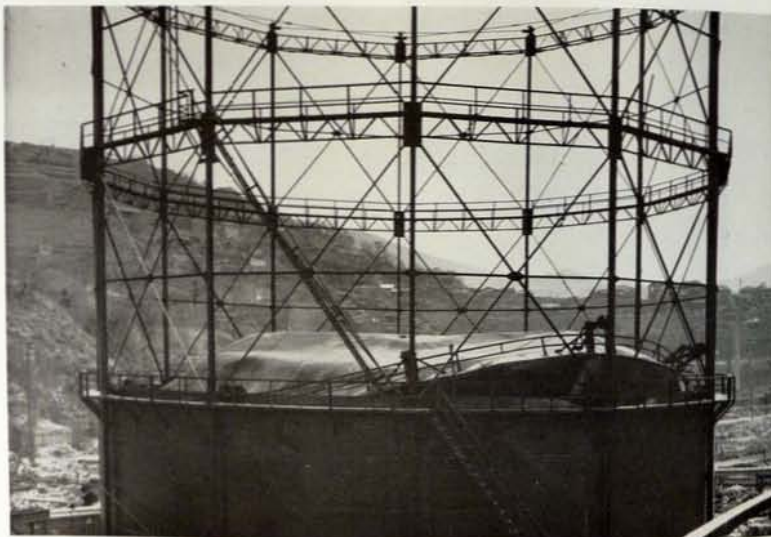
6,600 feet from GZ. Gas Holder 1 showing damaged tank top, Yachiyo-Machi Gas Works.
